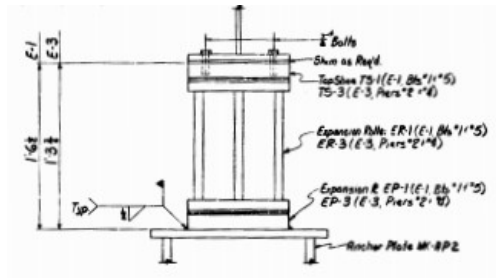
Expansion Shoe at Abutments and Piers 2 and 4 for Bridge (NBI 19430) (1982)
